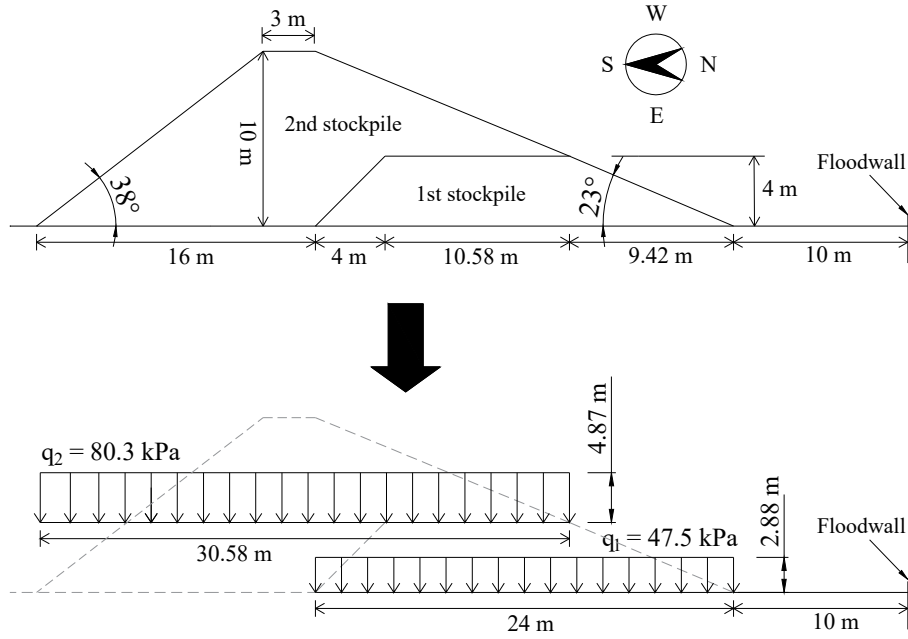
Cross-section of stockpile No.1 behind building 6.
